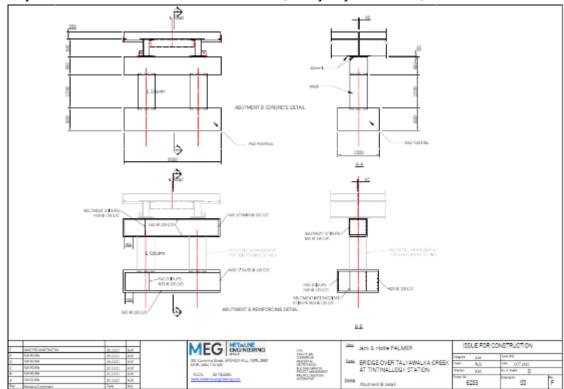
Architectural Drawings/ structural dwgs for installation of preconstructed bridge over Talywalka Creek at Lot3995 in DP 766468, Teryawynia Station,
